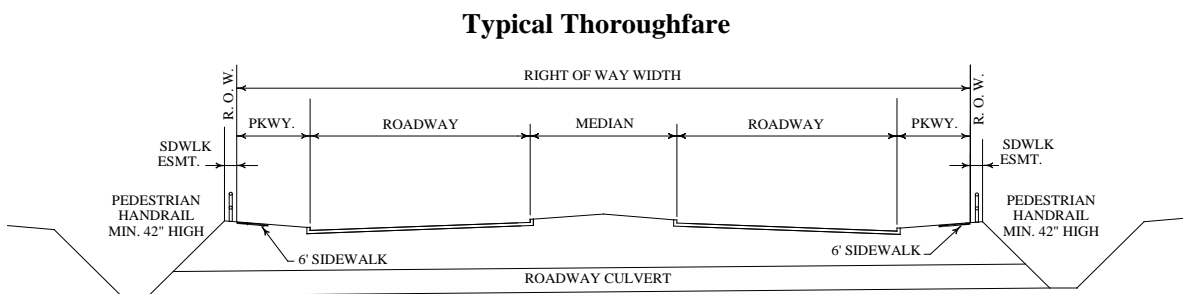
Typical Pedestrian Handrail Over Culvert
